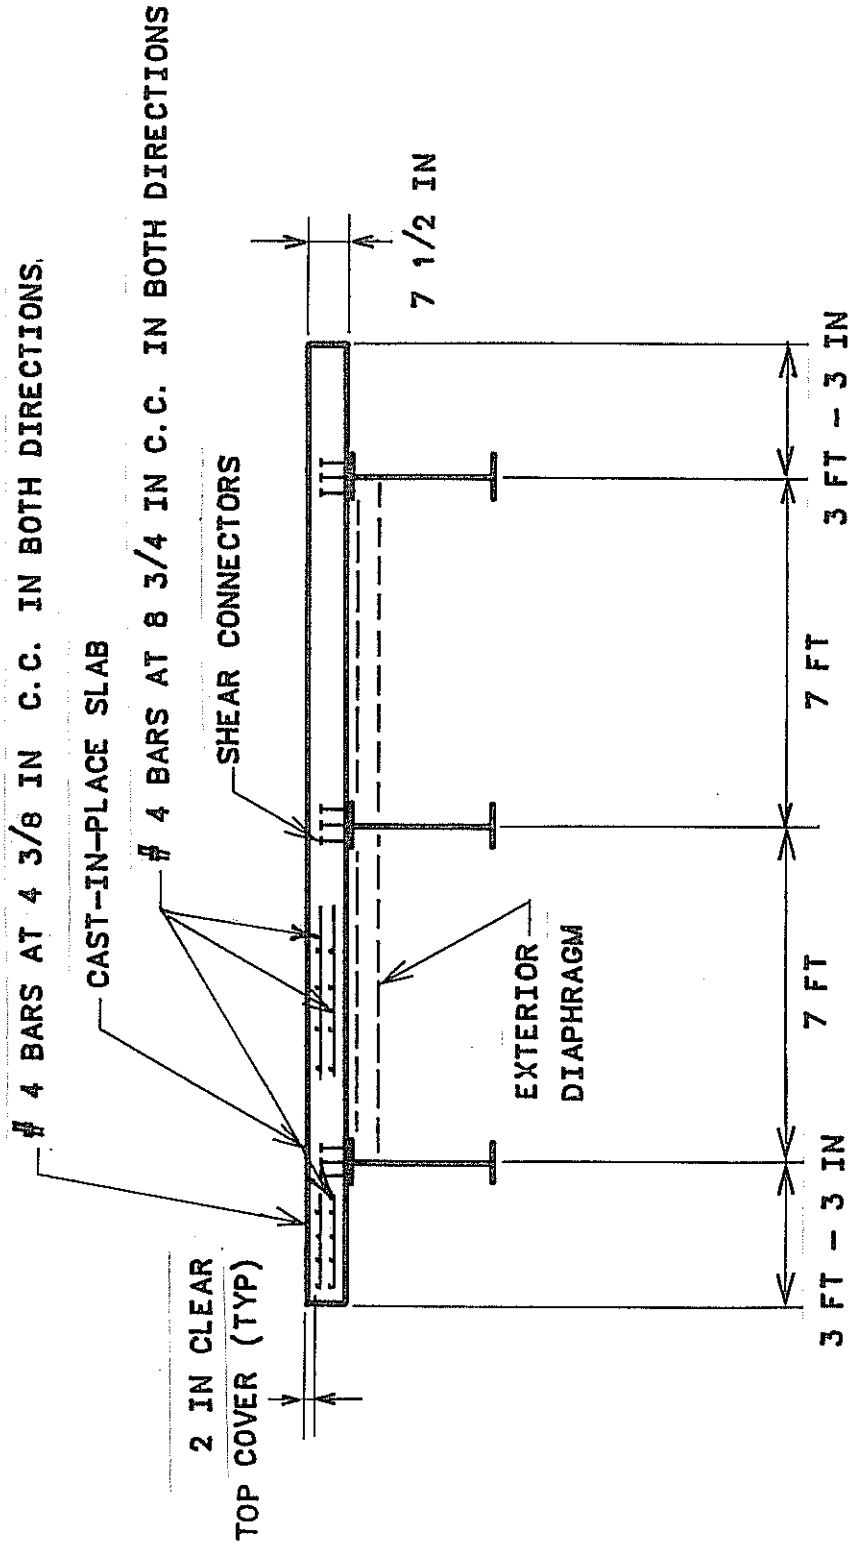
Cross section of laboratory specimen showing cast-in-place deck
